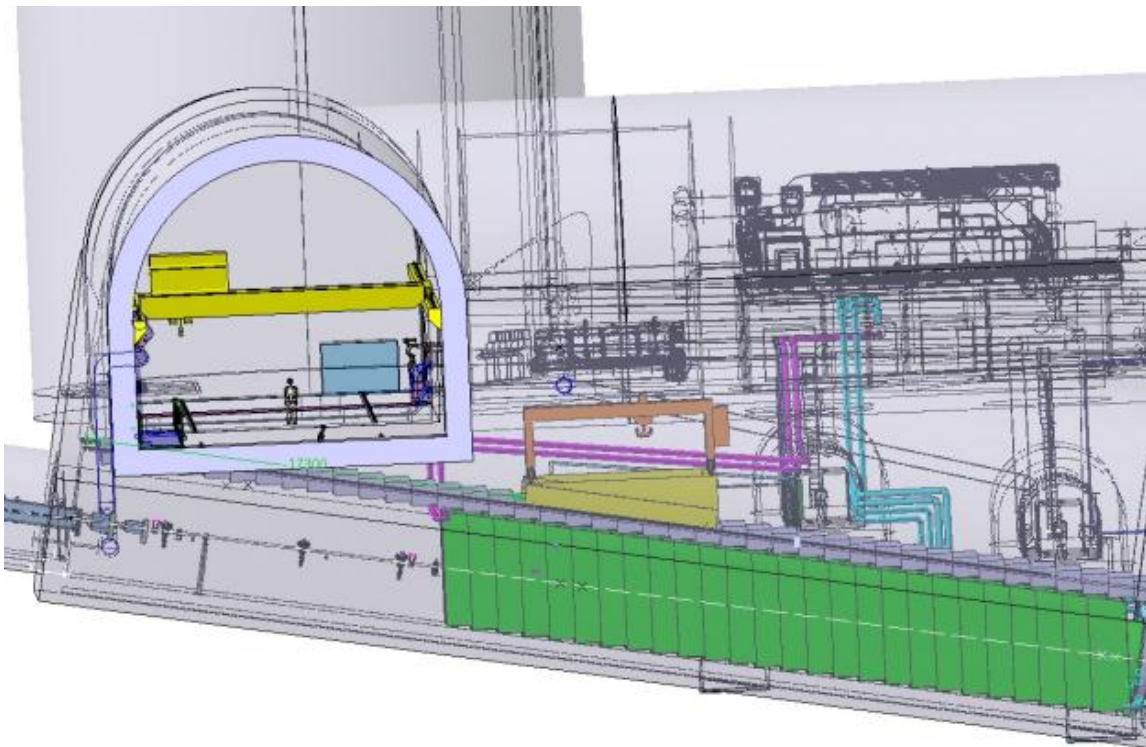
Layout of the gantry crane in the beam tunnel.
